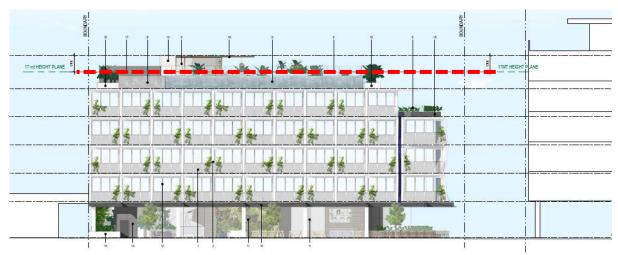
Western elevation showing Memorial Avenue frontage with the 17m height plans dashed in red.
